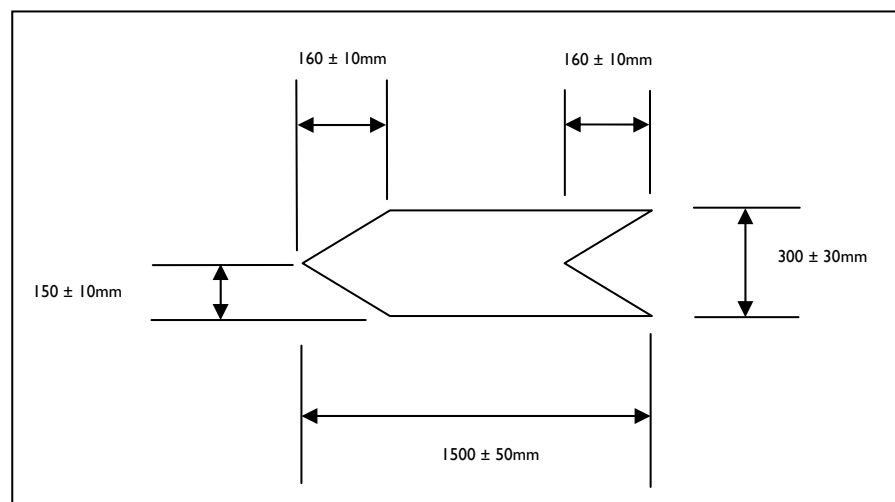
Dimensions of Yellow Painted Retroreflective Chevron Central Concrete Barrier.
